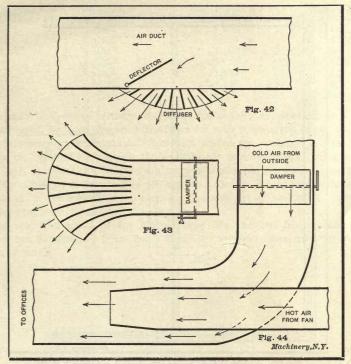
Outlet for Hot Air from Side of Duct. Fig. 43. Diffuser Outlet and Adjusting Damper for End of Branch Duct. Fig. 44. Injector Arrangement for Mixing Hot and Cold Air
